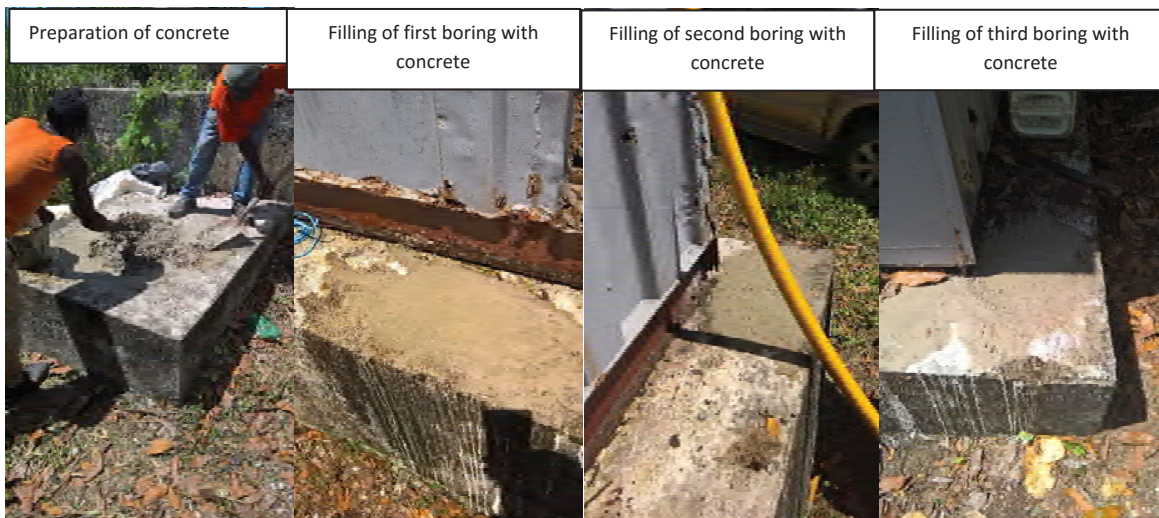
Pictures showing concrete preparation and infilled boring with prepared concrete mix
